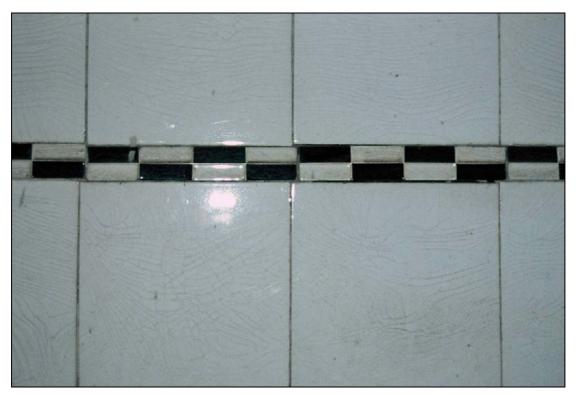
Detail of black and white tiles, G13, wash house (film C/S 4.6)
